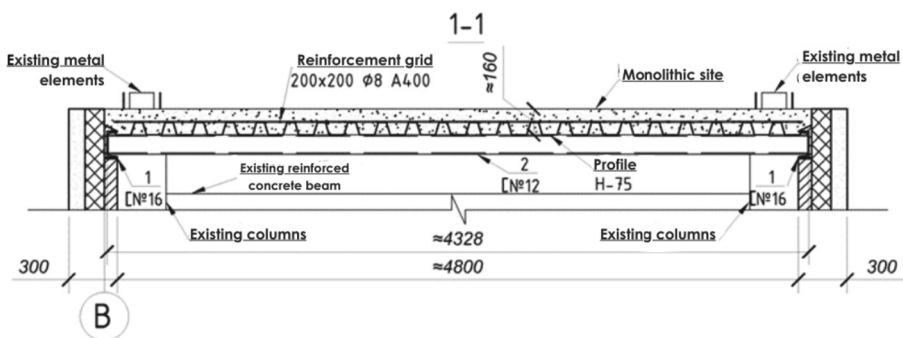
Scheme of arrangement of fixed formwork and cover slab. Cut 1-1.
